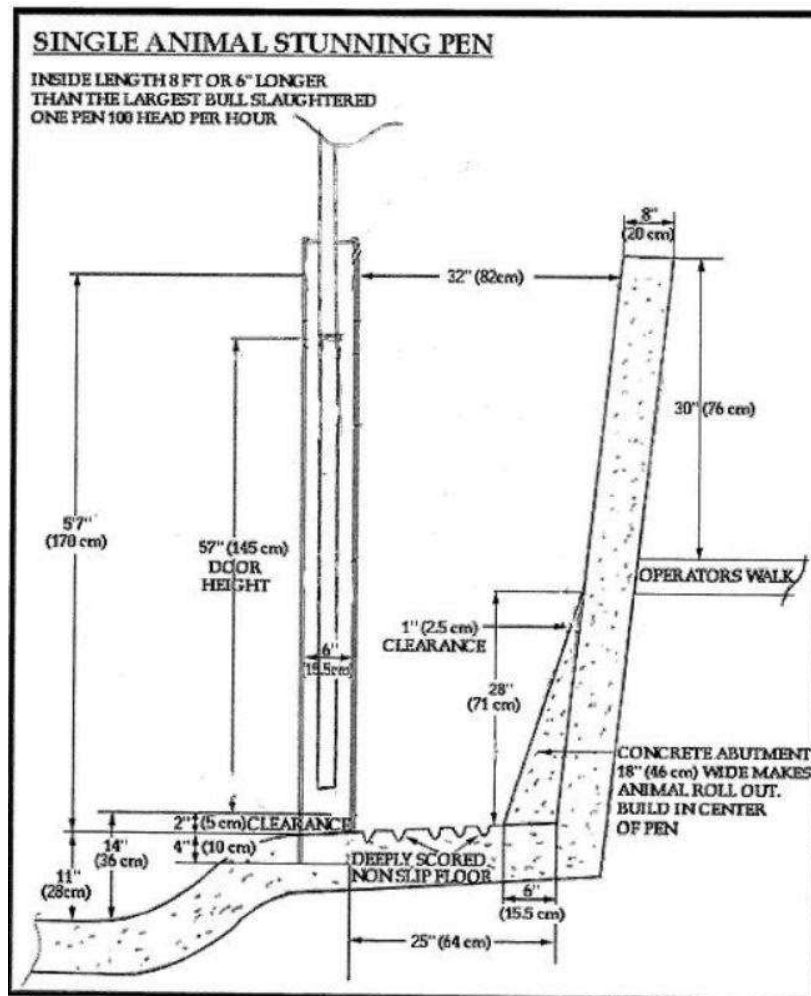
Stationary chute with slanted concrete wall and lifting gate design (Grandin, 2018)
